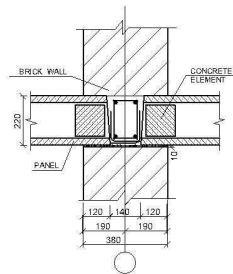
Critical Structural Details: wall section showing concrete bond beam
